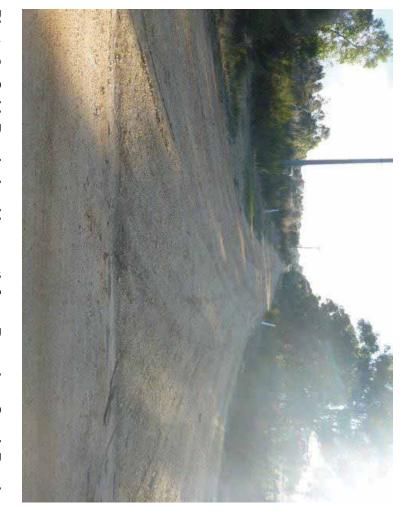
Cobb Road - Looking north from Boundary Creek Road
